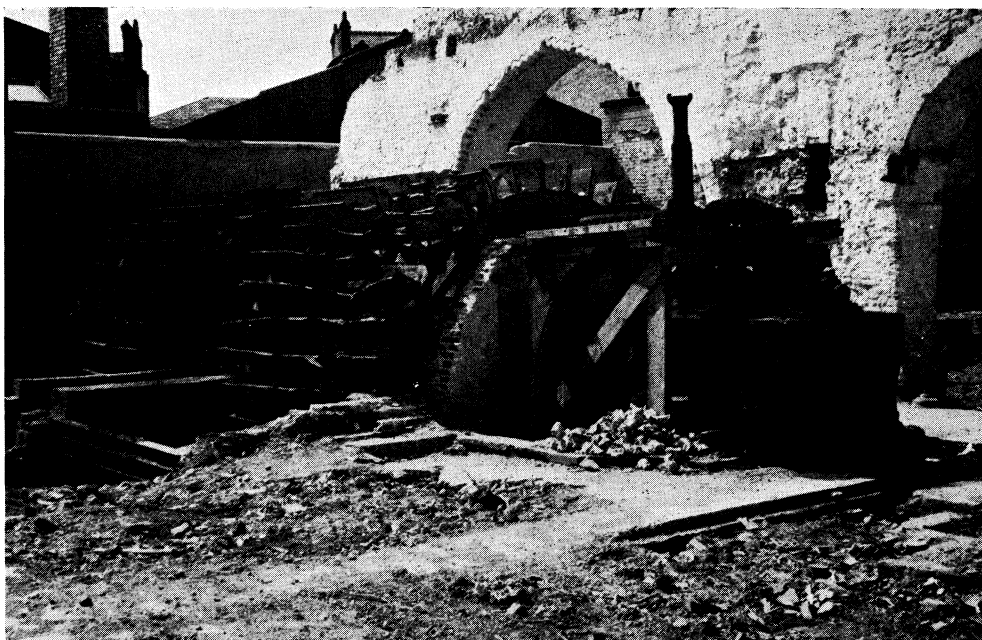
The Abbey Mill : the latest mill machinery.
